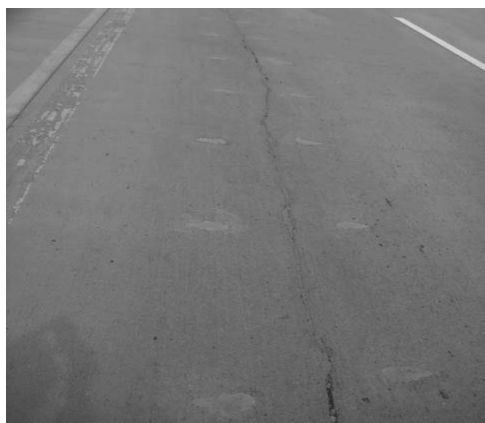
Longitudinal crack in cement concrete pavement of the highway “Astana-Burabai”
